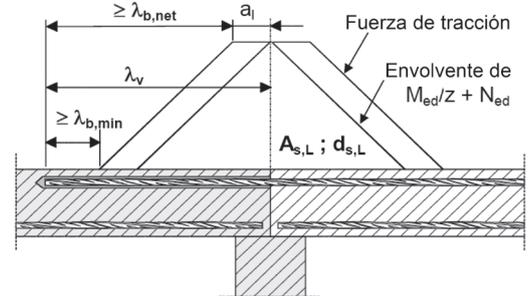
Reinforcement anchor to cover the action line of the tensile force.
